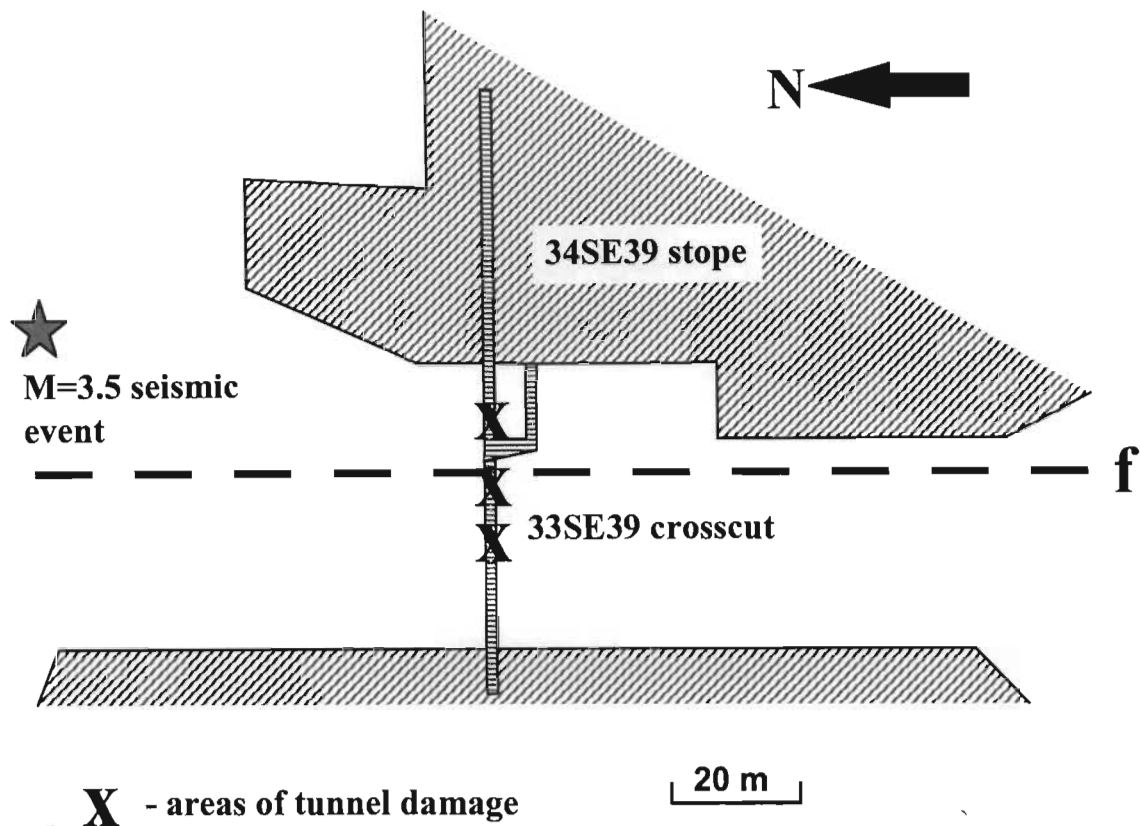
Schematic plan of the 33SE39 stope and tunnel layouts with areas of observed damage.
